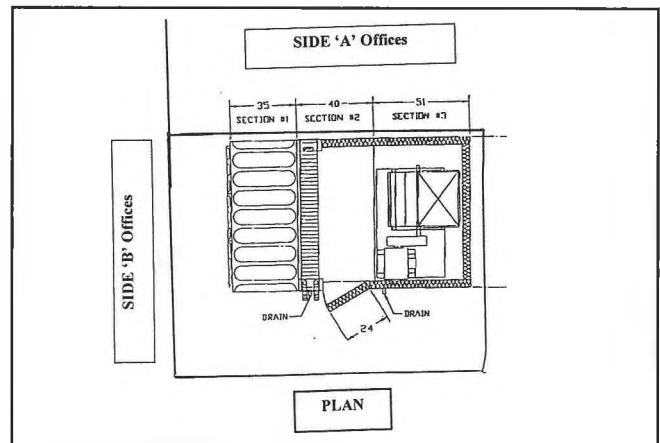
Layout Plan of the Compartment Unit and Adjacent Offices.
